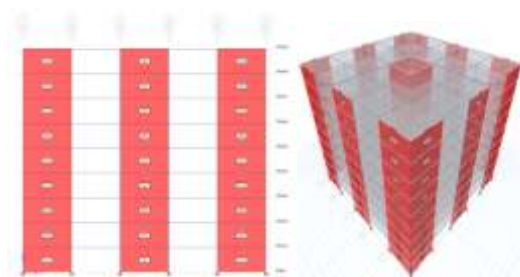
Corner Shear wall+ Core model with 5% Openings
